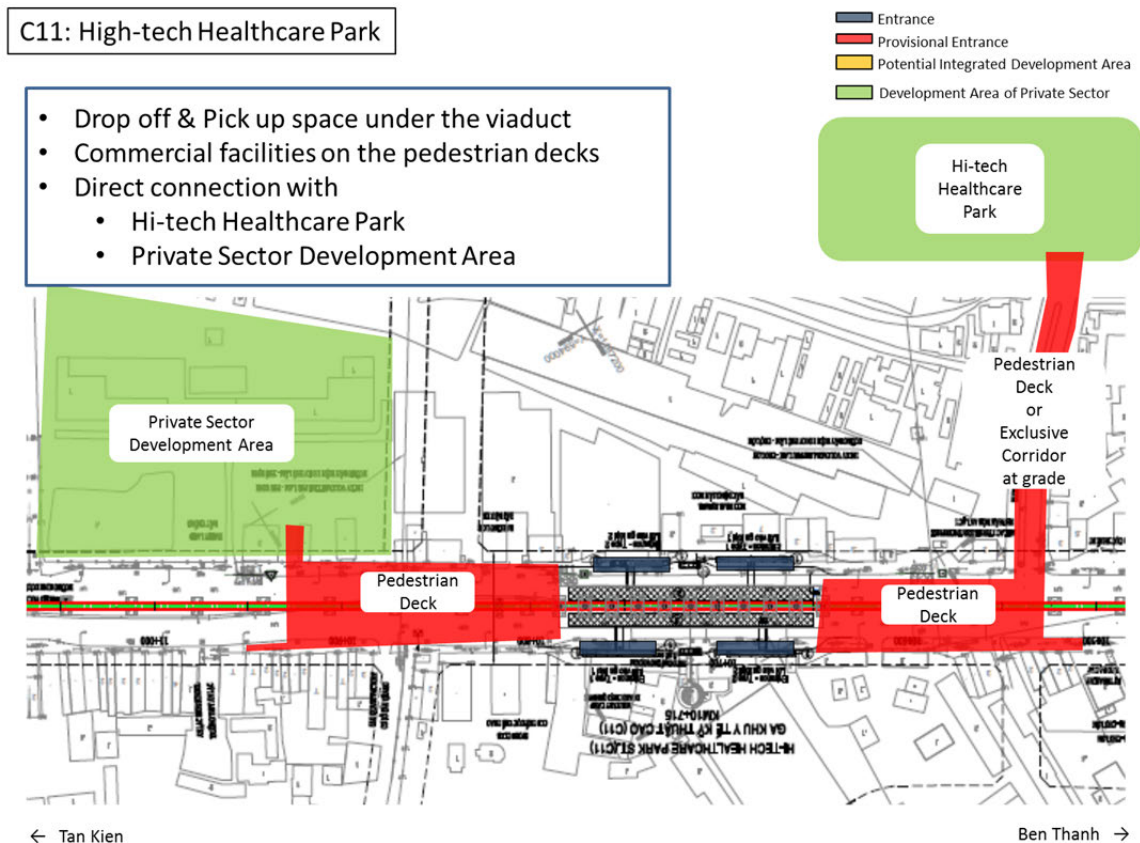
Development Concept of Hi-Tech Healthcare Park Station
